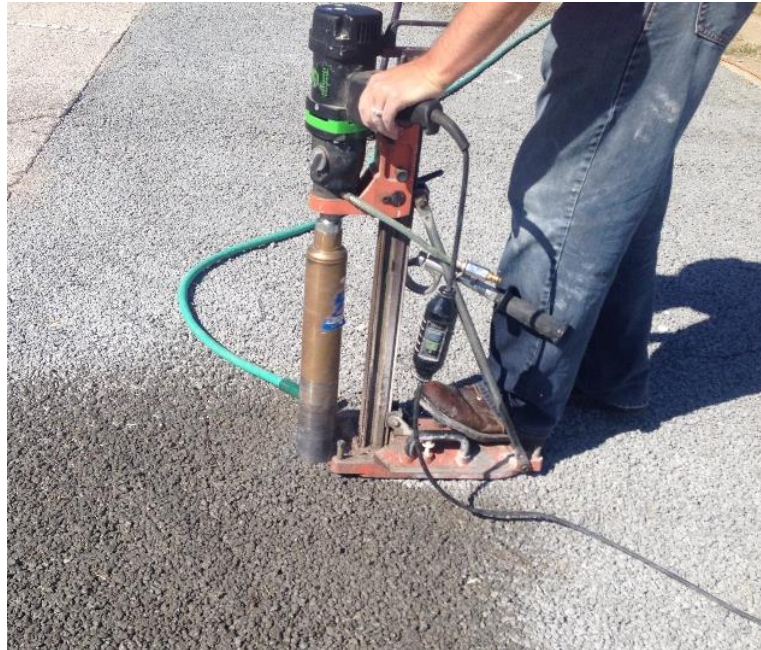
Coring drill and rig used to collect pervious concrete cores from the Tulsa, OK demonstrating plots
